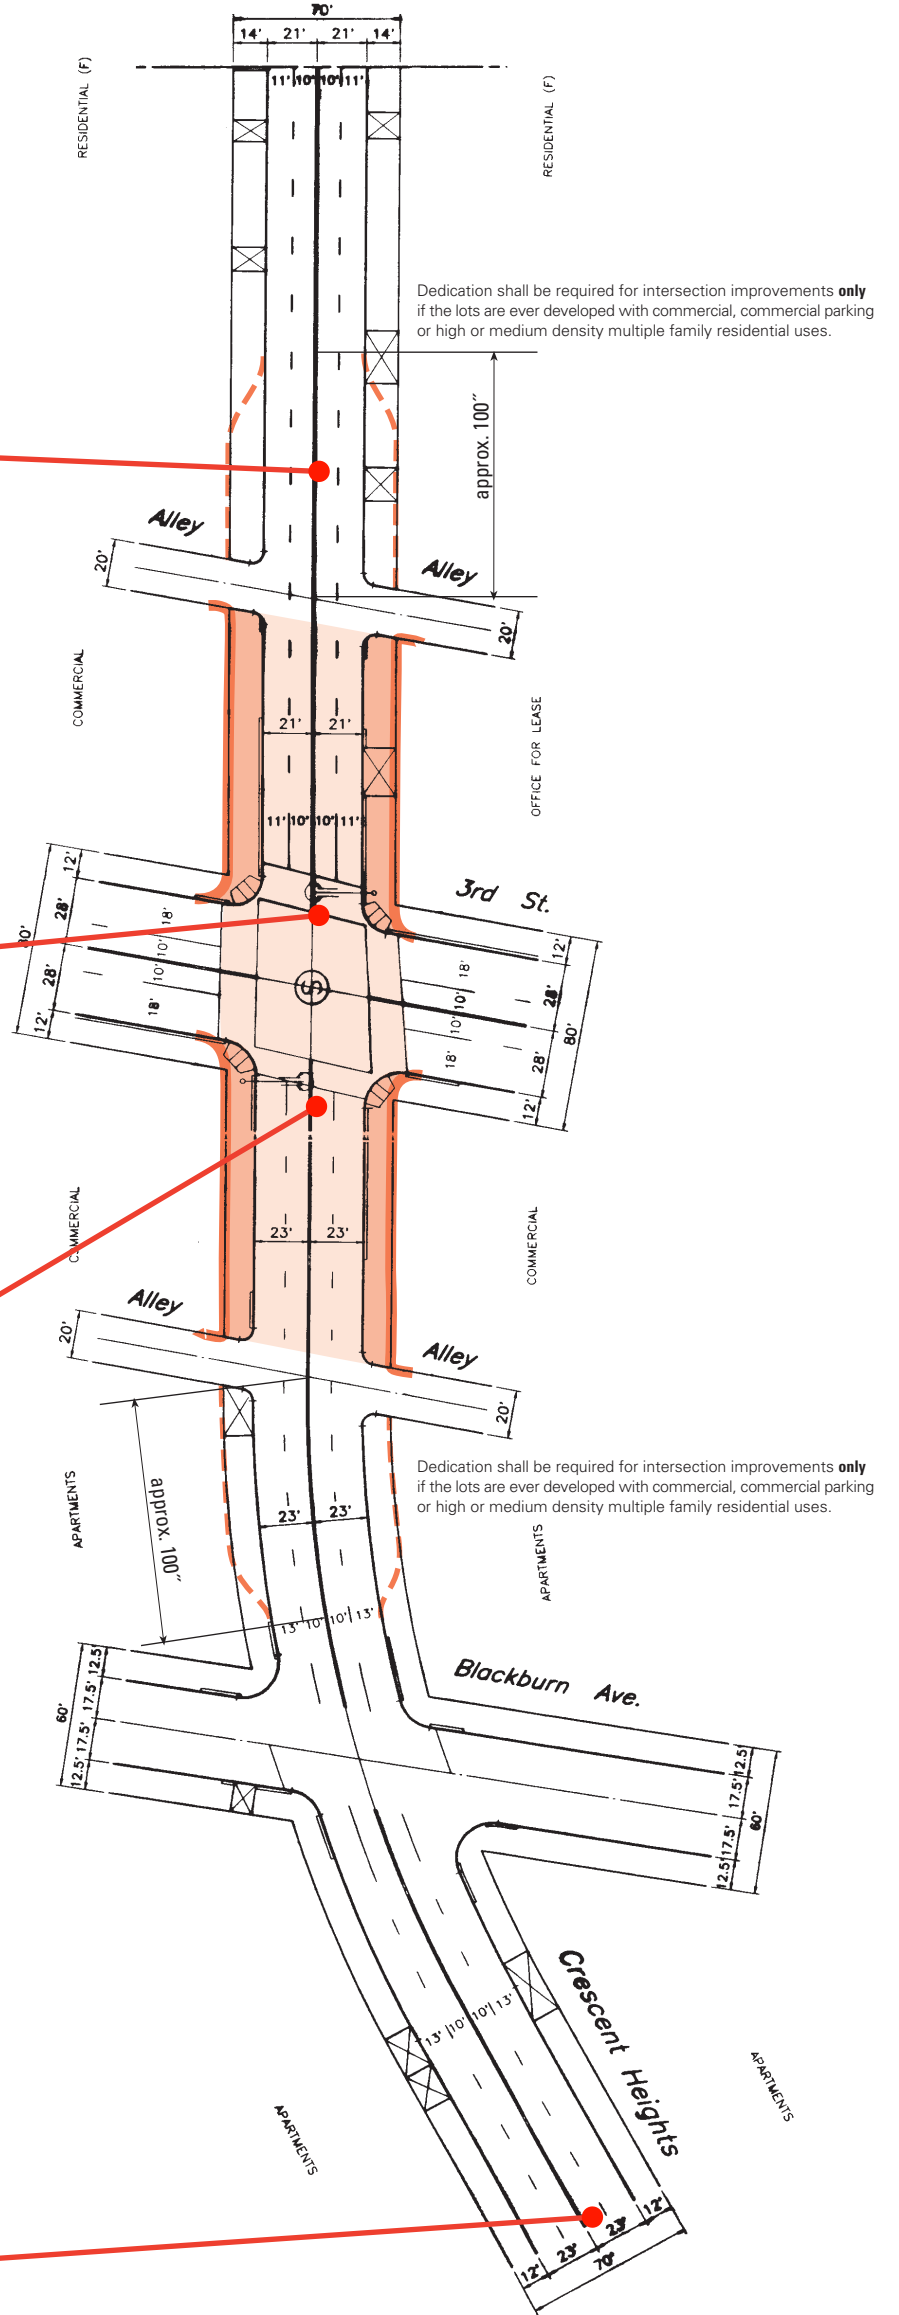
Exhibit C GENERAL MODEL of INTERSECTION IMPROVEMENT Crescent Heights Boulevard & Third Street
